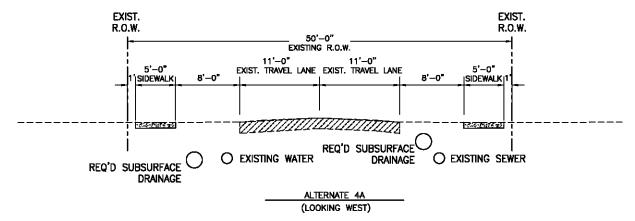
Typical Roadway Section with Proposed Sidewalks along Minnesota Park Road (Source: RCLC)
